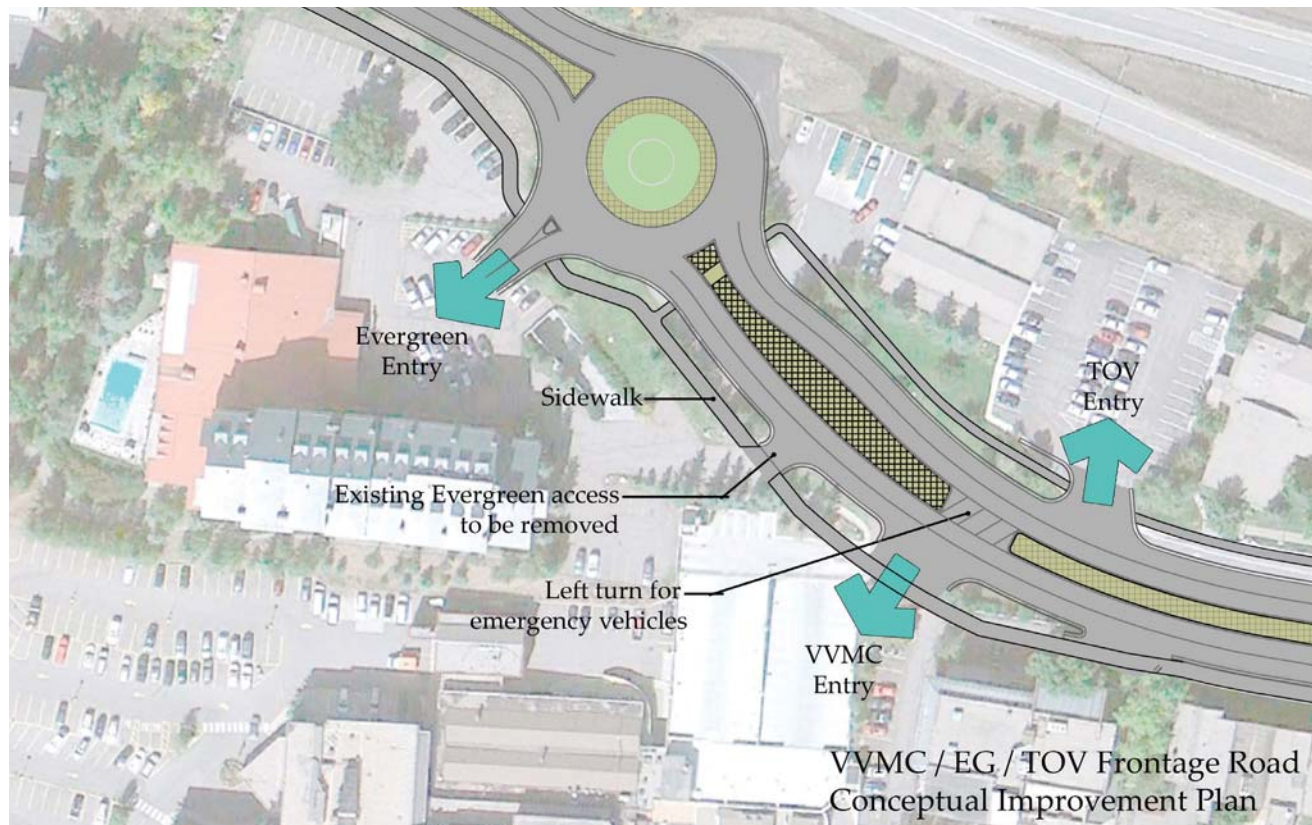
Conceptual design of South Frontage Road access improvements.
